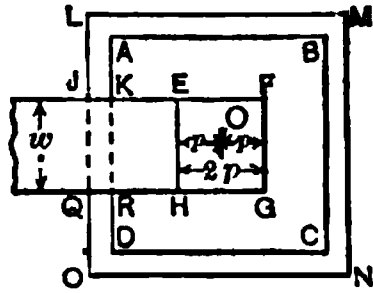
Square Supporting Area. Isolated Load on End of Wall
